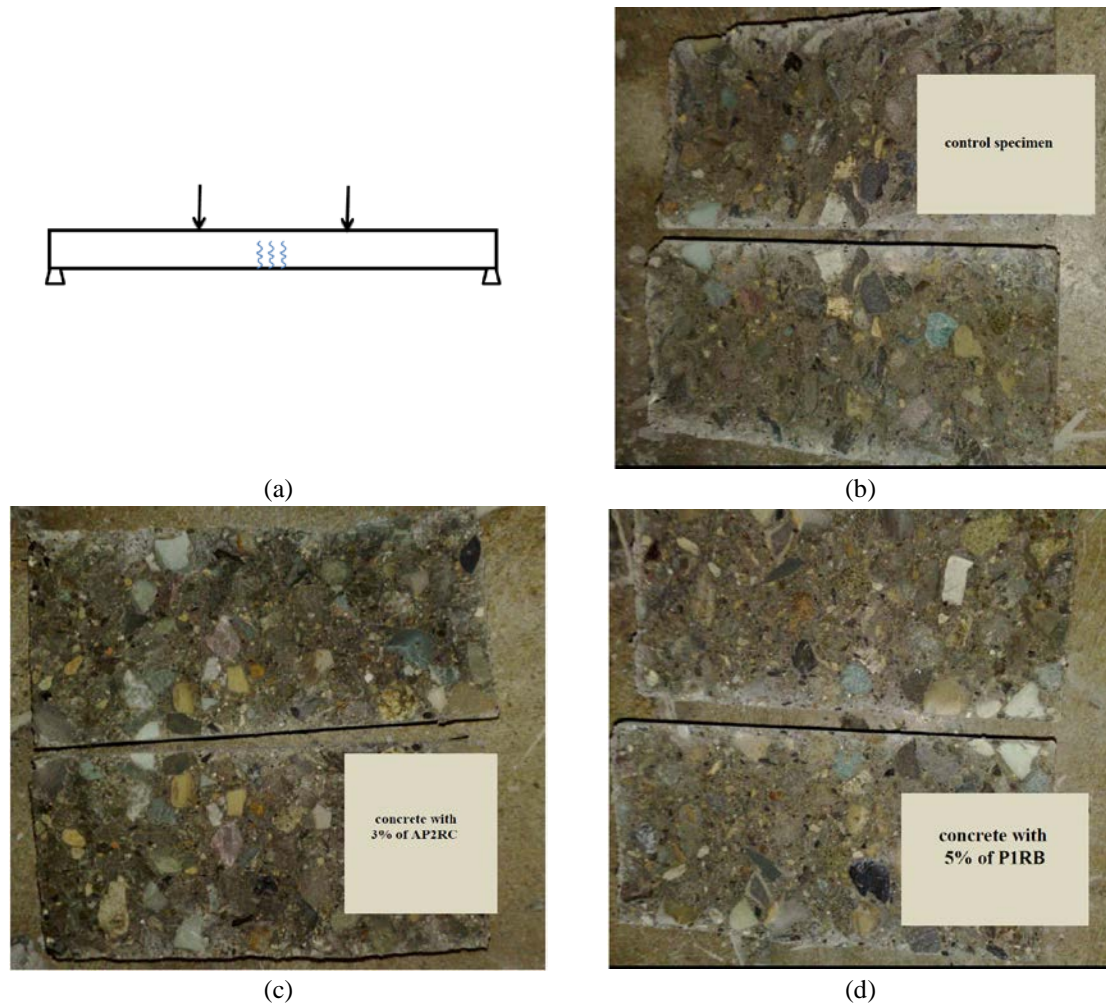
Crack patterns of Prismatic specimens in flexural strength; (a) schematic cracks, (b) control specimen, (c) AP2RC specimen and (d) P1RB specimen
